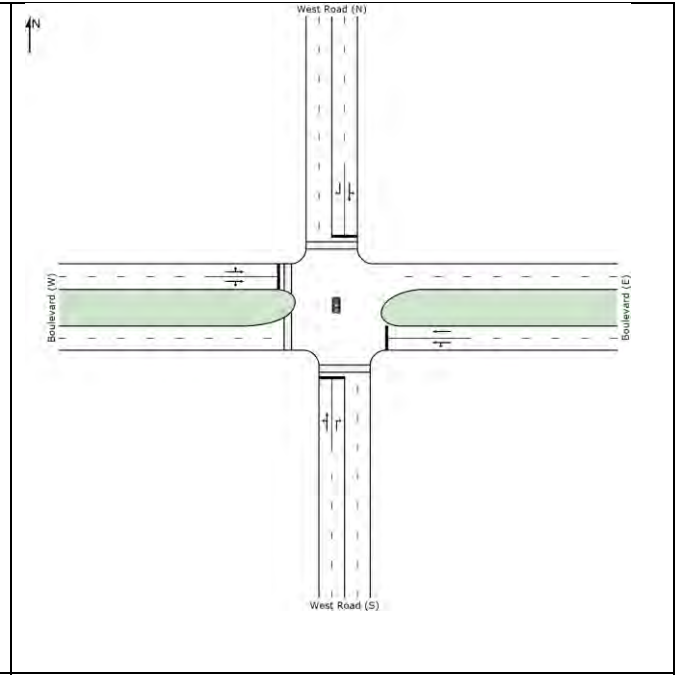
Variant 2c Parkes Way Boulevard – West Road Intersection
